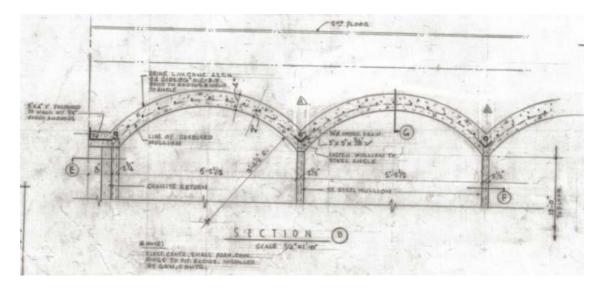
Concrete canopy section, *Original drawing by architect Lee Casaccio, Alterations Colonial Federal Savings and Loan, Sheet 3 - Front Elevation and Details, 1962, courtesy of Lee Casaccio, Jr.
